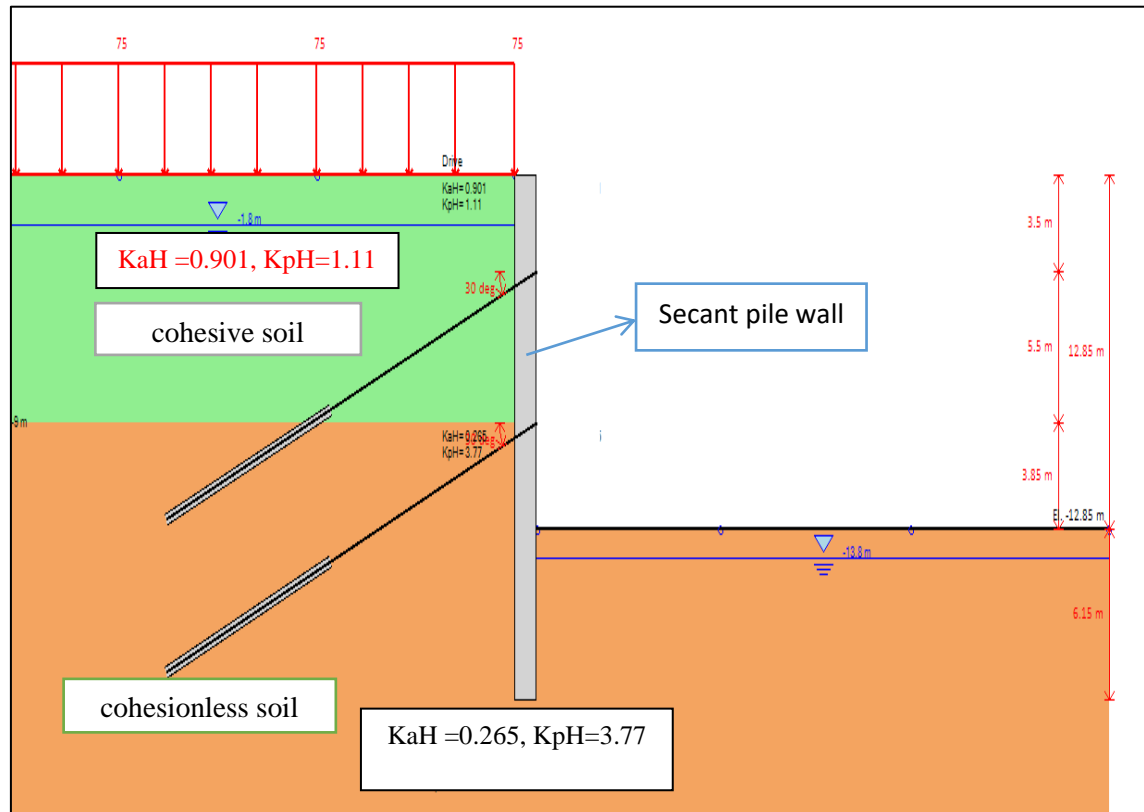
Secant pile wall Al Dawoodi/Al Mansur District
